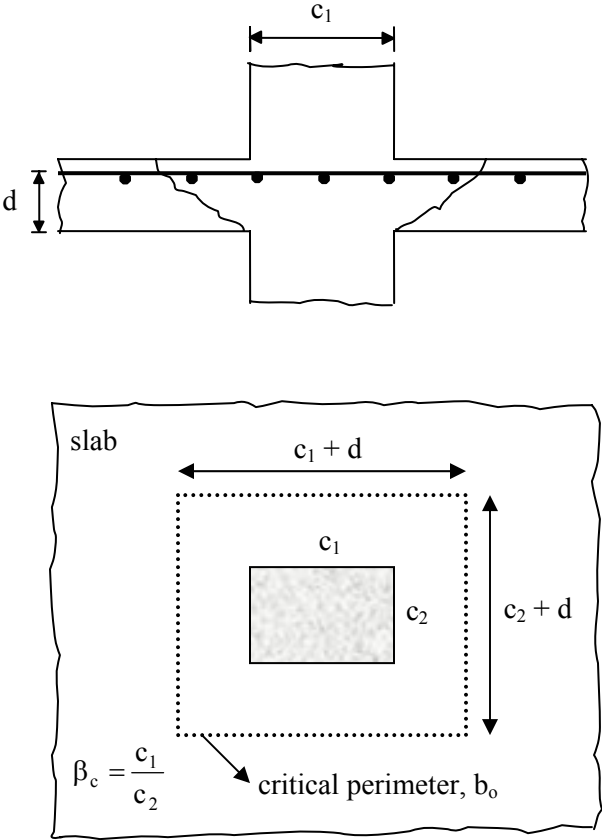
Illustration of Punching Failure Phenomenon at a Slab-column Connection
